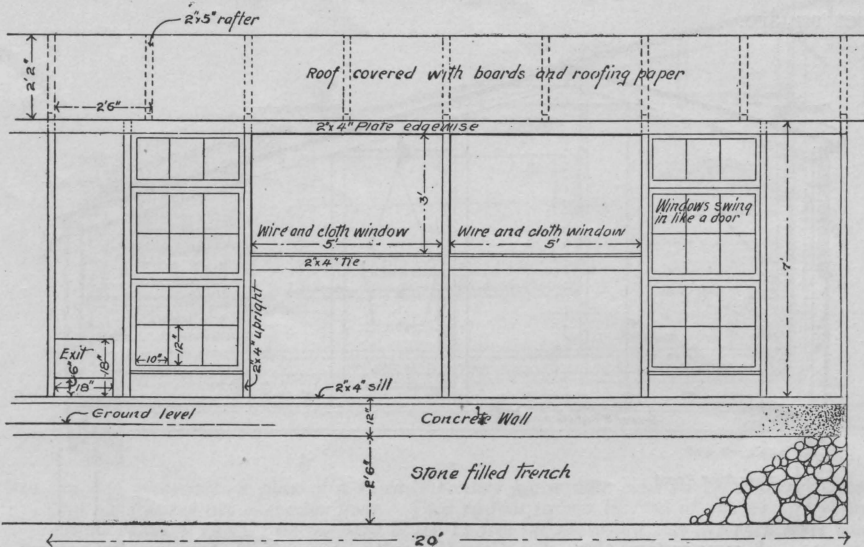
Front elevation of a Cornell poultry house with pens 20 feet square, adapted to the combination roof
